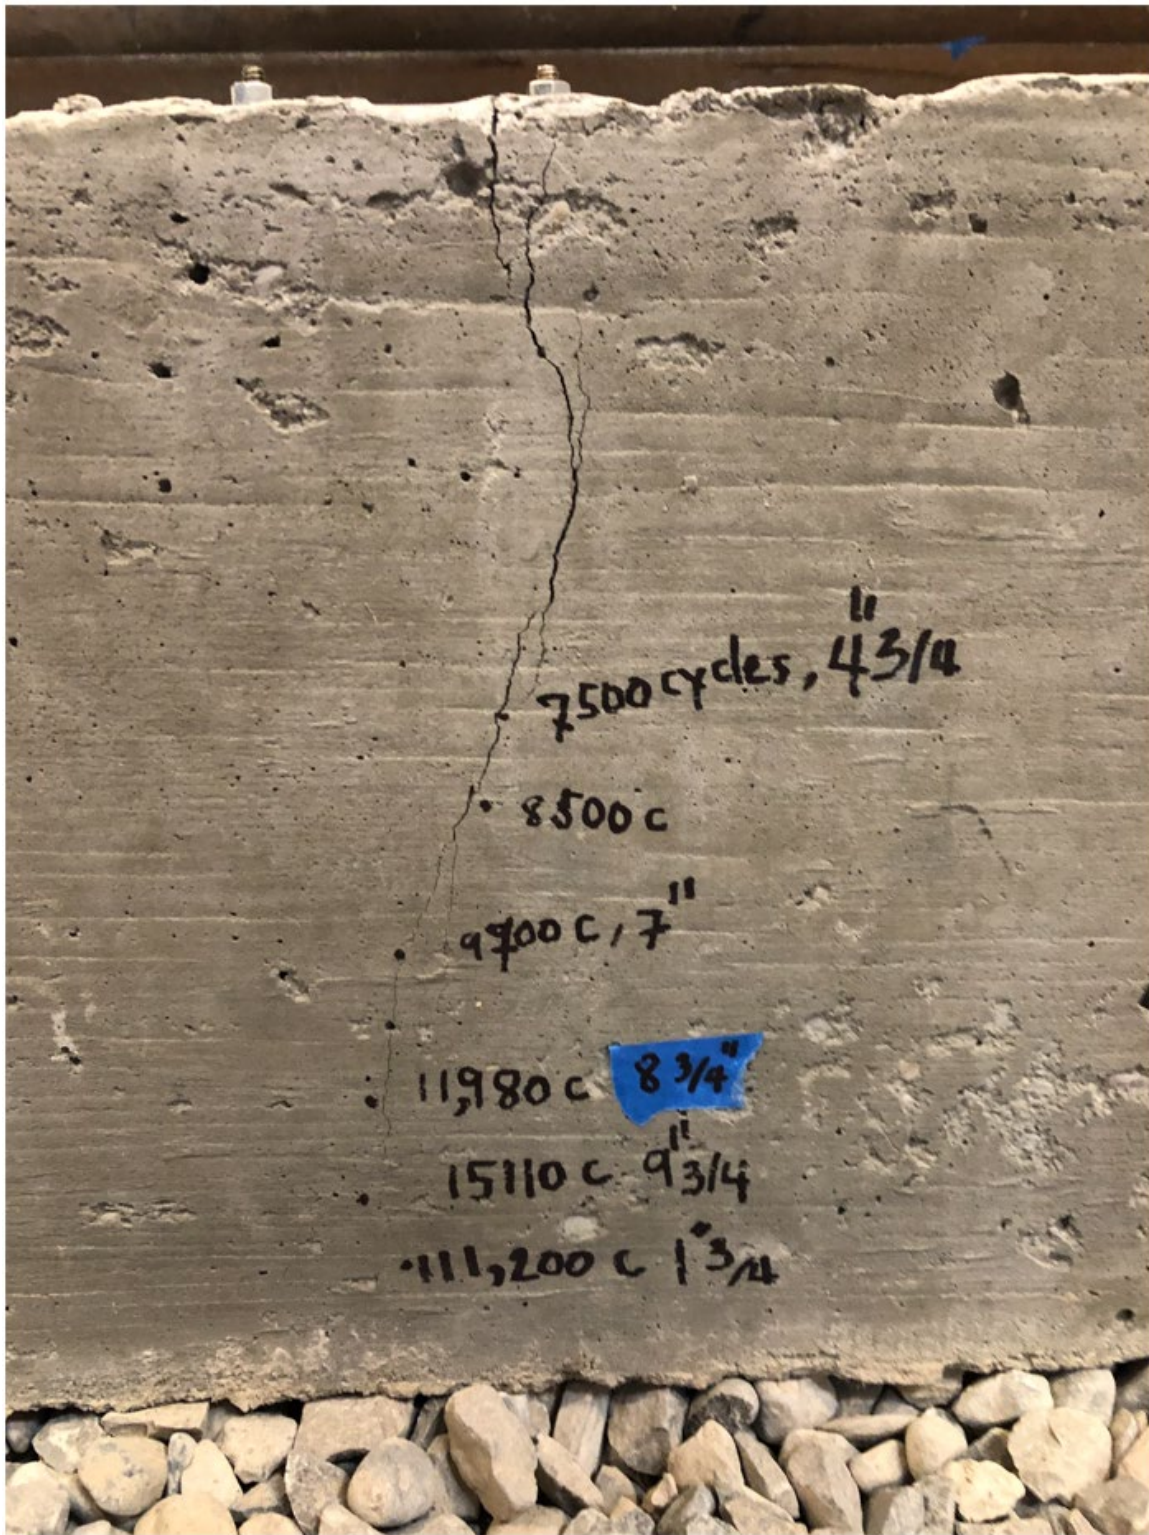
Side Crack Propagation in Panel with Steel Reinforcement
